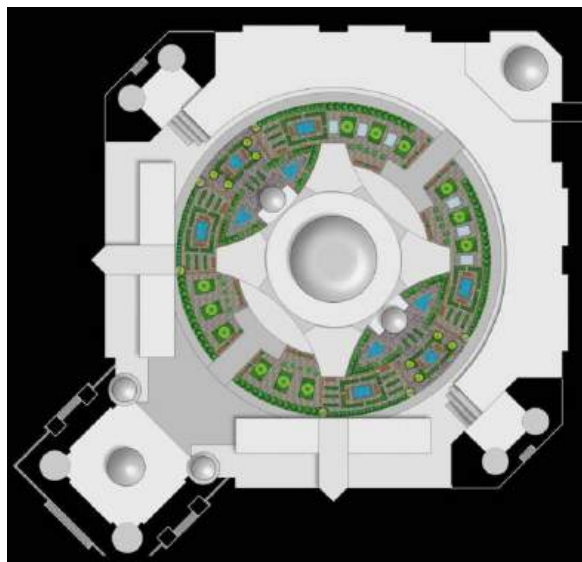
Use the indoor garden element of Nineveh Governorate's new office building
